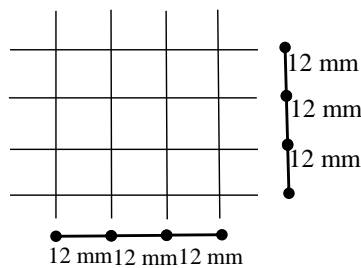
Geometrical Grid of PVC Coated Welded Wire Mesh
